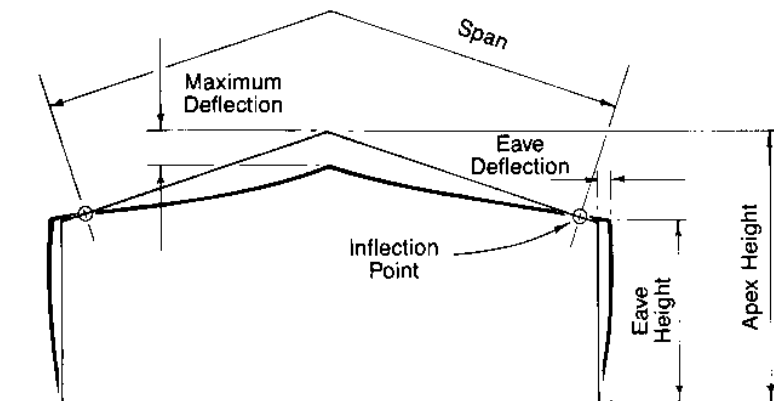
Gable Frame Deformation under Gravity Loads
